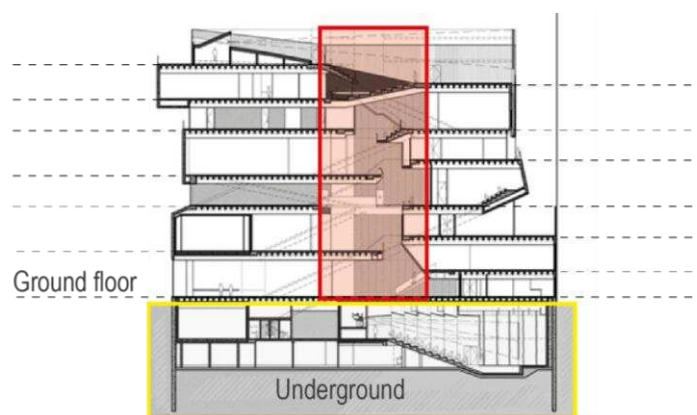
Building's longitudinal section featured for the central atrium (in red), which connects the floors. In yellow, the underground.
